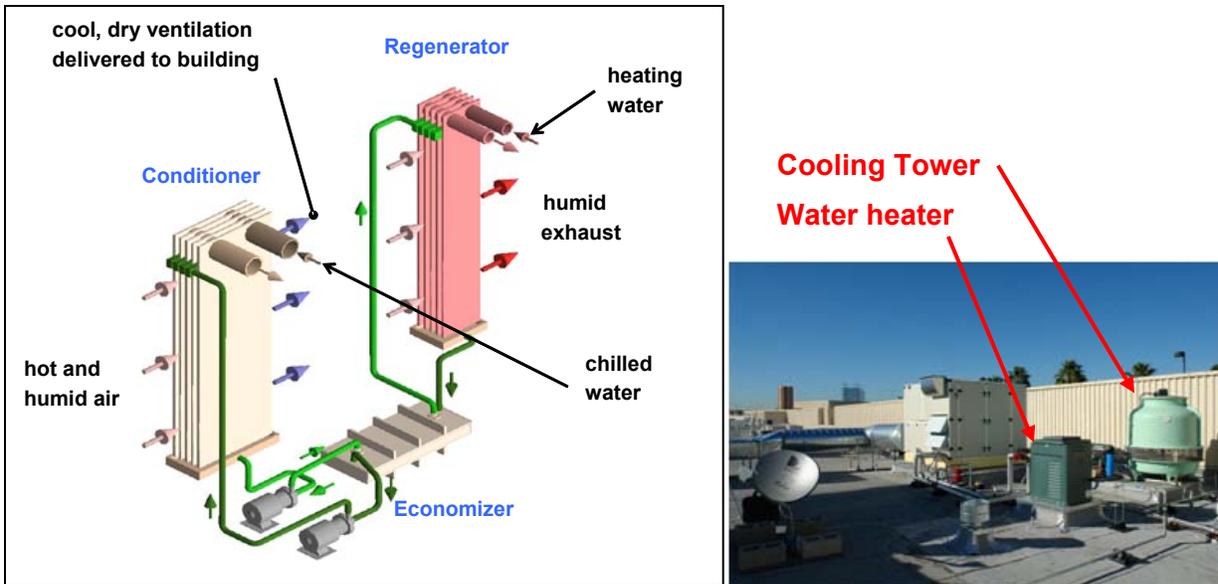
Major components and packaging of the AILR LDAC (Photograph shows packaged HMXs, water heater and cooling tower)
